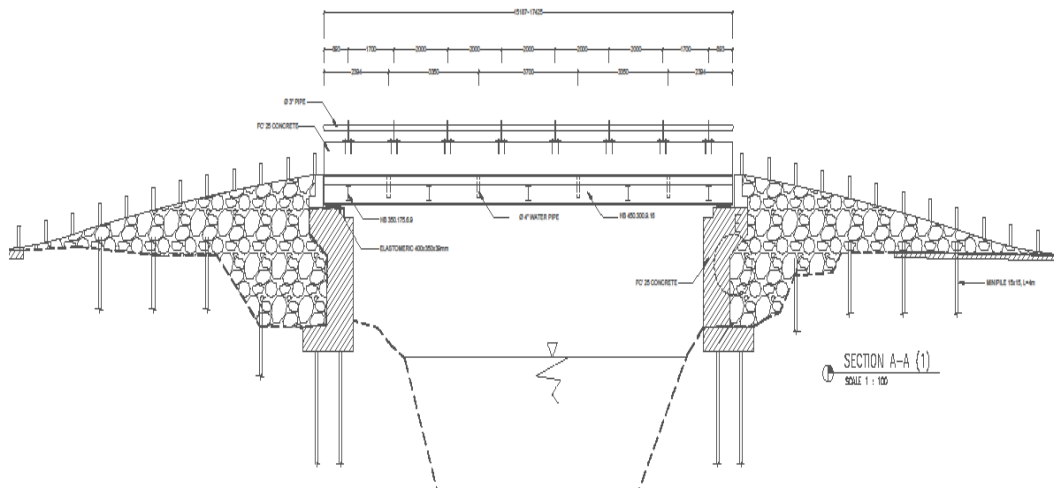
Section of the Kanaan Bridge (Source: CV Elza Jaya Prima)
